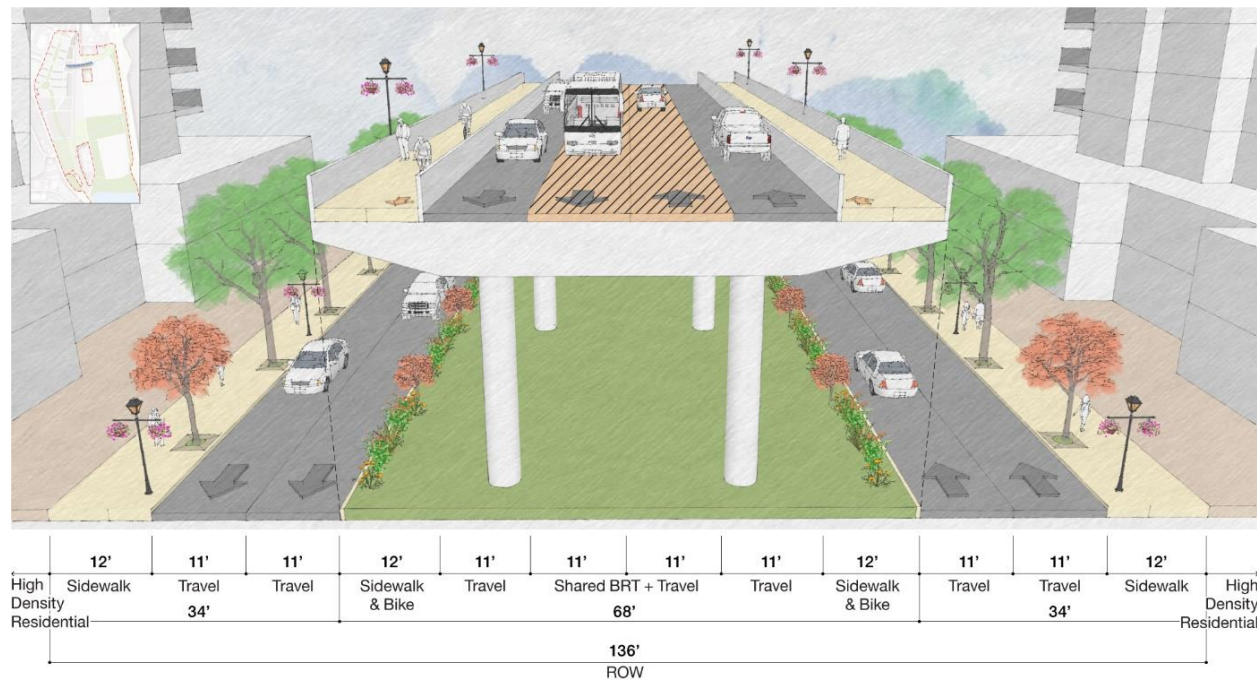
Geneva Avenue Cross-SectionsGENEVA AVENUE BRIDGE APPROACH AND FRONTAGE ROADSGENEVA AVENUE BRIDGE AND FRONTAGE ROADS
